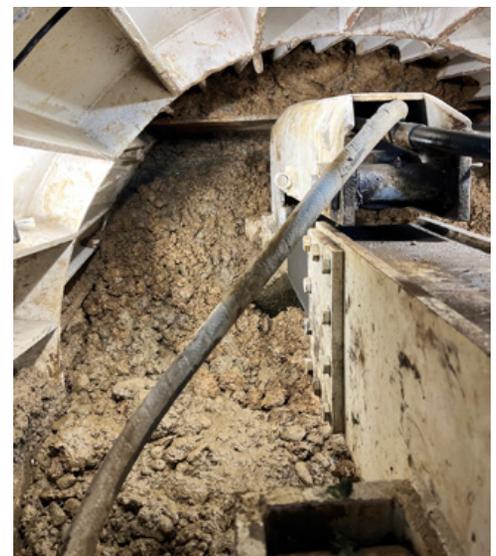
Exposed tunnel face Oct. 20, 2025 (Courtesy Gonzales)
